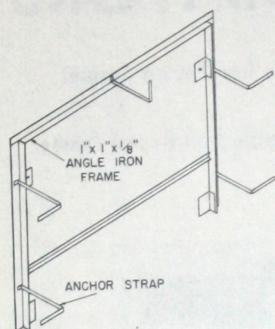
Rear View of Angle Frame. (Recess Liner removed for clarity).
